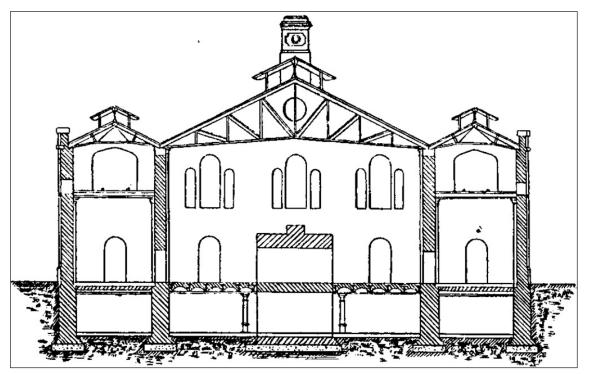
A stage-floor horizontal retort house. Source Newbigging 1889.
